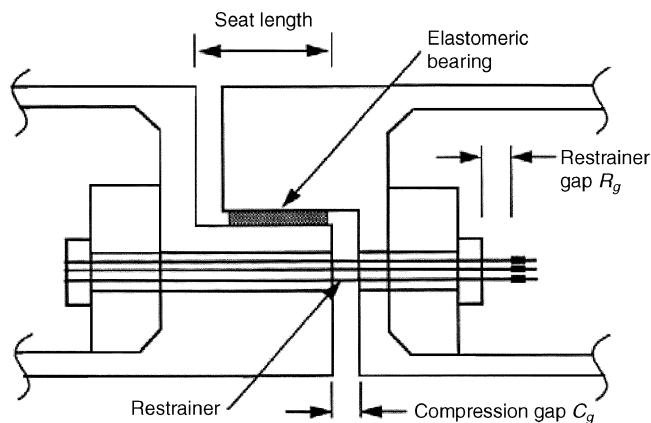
Typical cable restrainer system. (Courtesy of the University of Washington).
